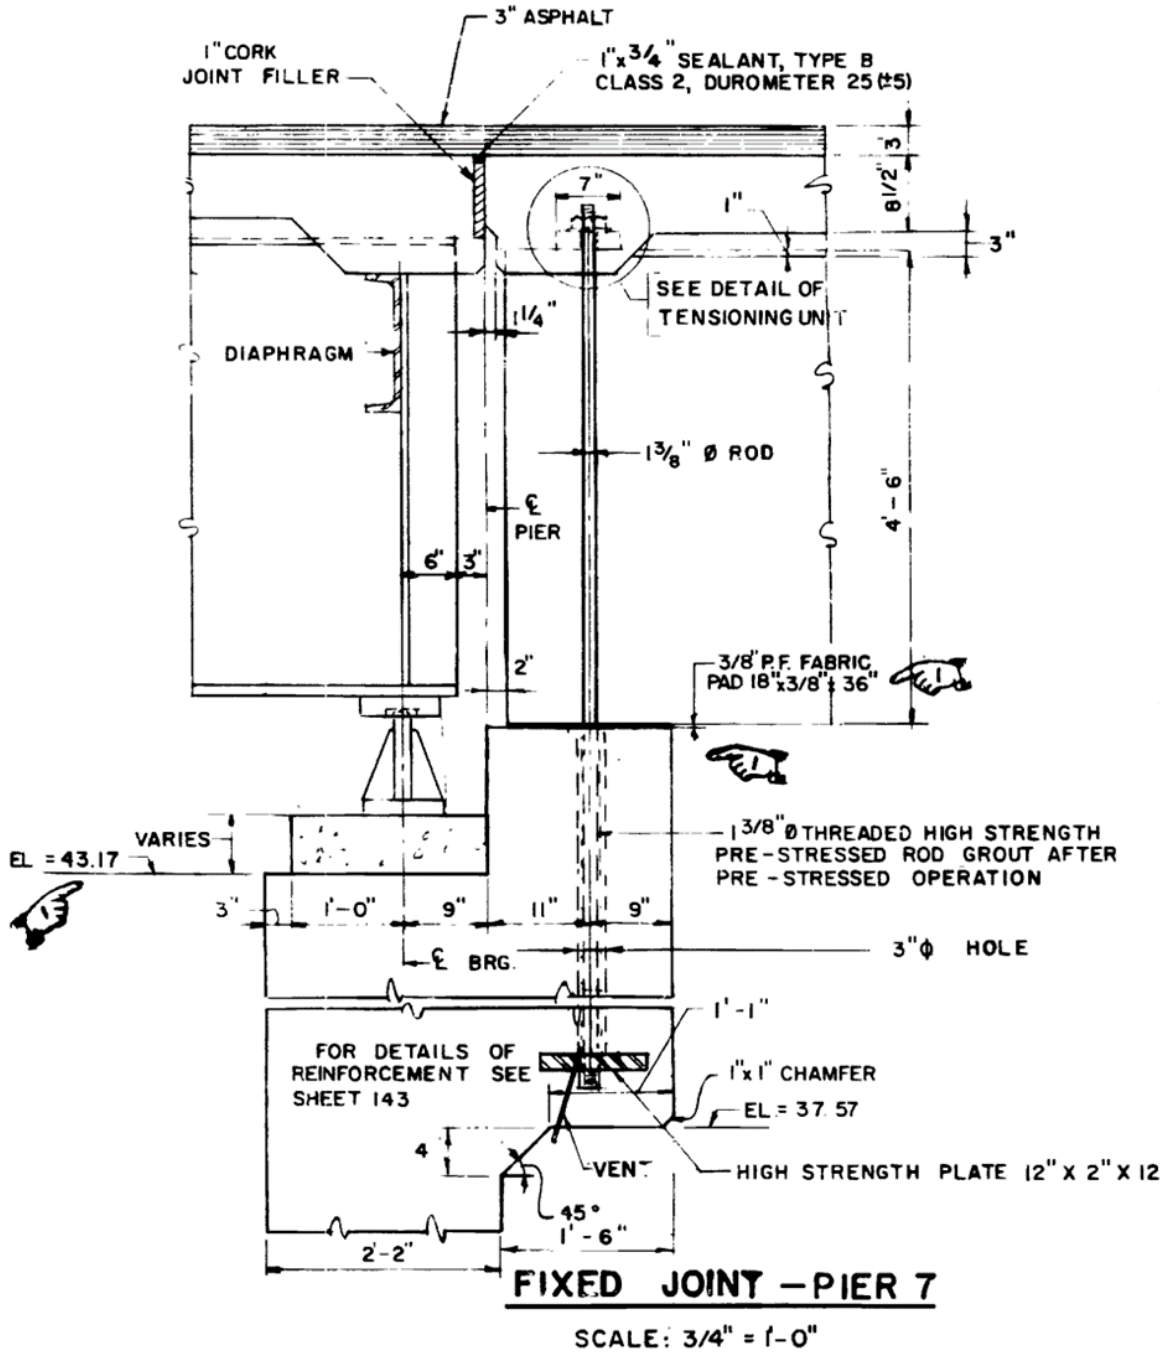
Section depicting steel and concrete beam bearing and PT anchor plates and tie-down rod details for Pier 7 (Sheet 139, Detail Sheet 4 of original plans, 1967).
